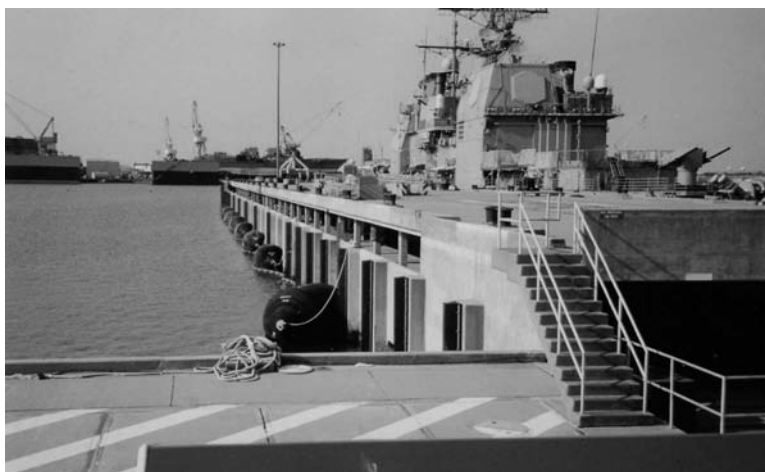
Double-decked U.S. Navy pier of precast/prestressed composite concrete construction
